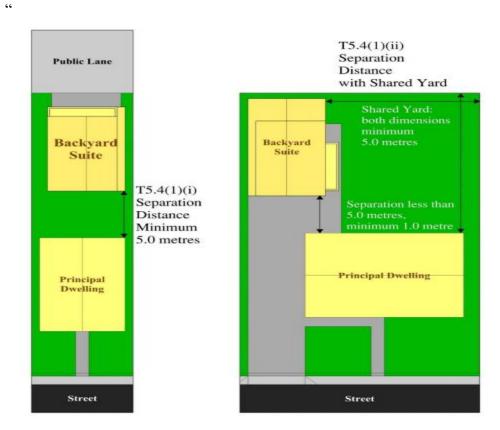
A.F2A: Setback from Primary Building for Dwelling, Backyard Suite"
